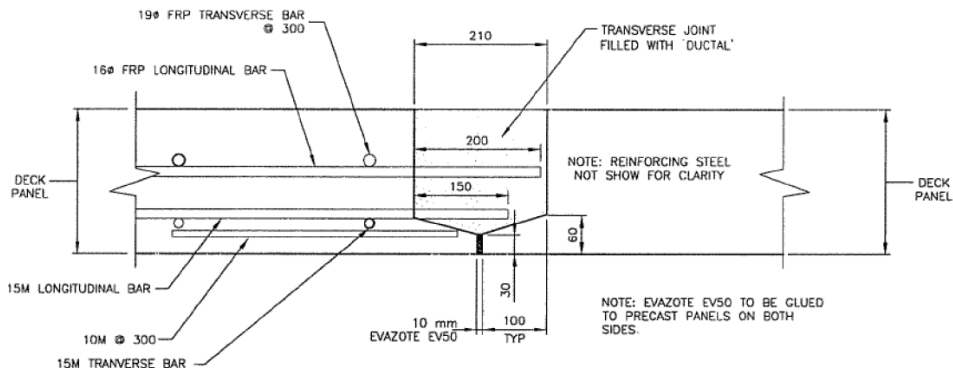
Details of transverse joints between precast deck panels in Rainy Lake Bridge, ON, Canada (Perry et al. 2009)
